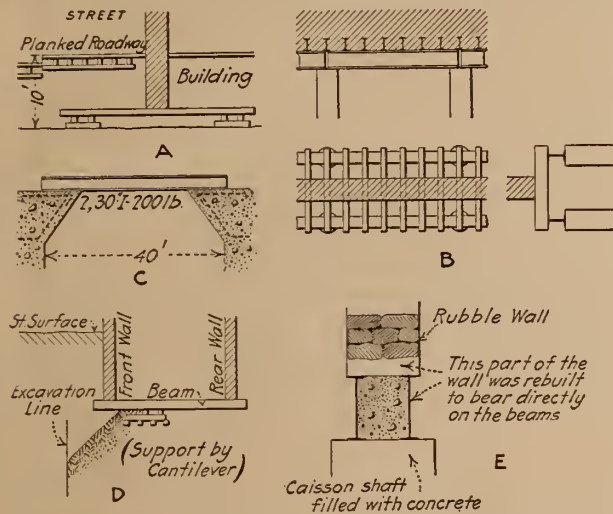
SKETCHES ILLUSTRATING VARIOUS TYPICAL METHODS OF UNDERPINNING BUILDINGS
